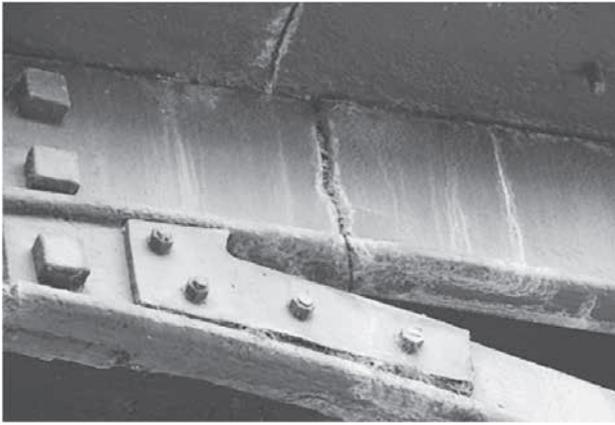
Misalignment of connection of arch rib at approach span of right bank (photo; November 2014)
